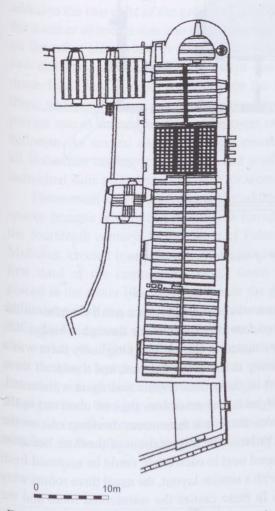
Ground plan of the upper floor of the palace wing, castle of Karlštejn
